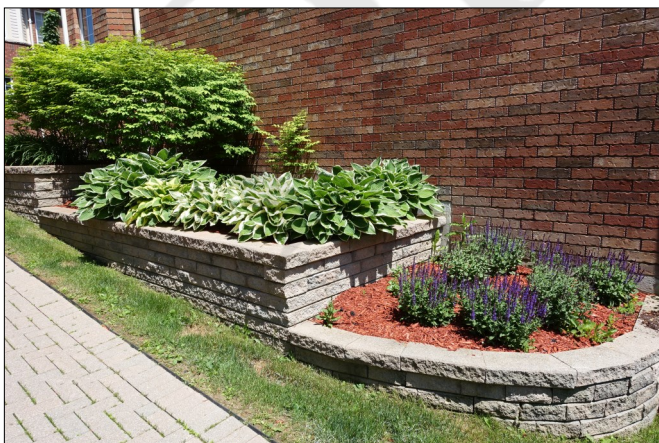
Landscape retaining walls should not be higher than 0.6 m
